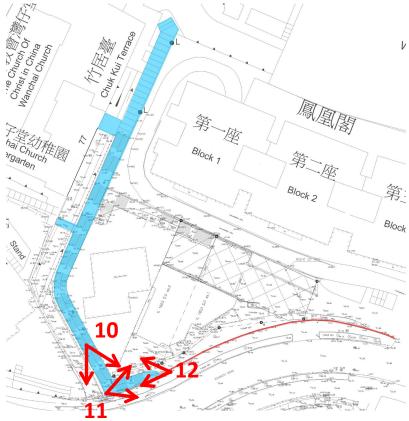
EXISTING SITE CONDITIONS (Spring Garden Lane Staircase)
